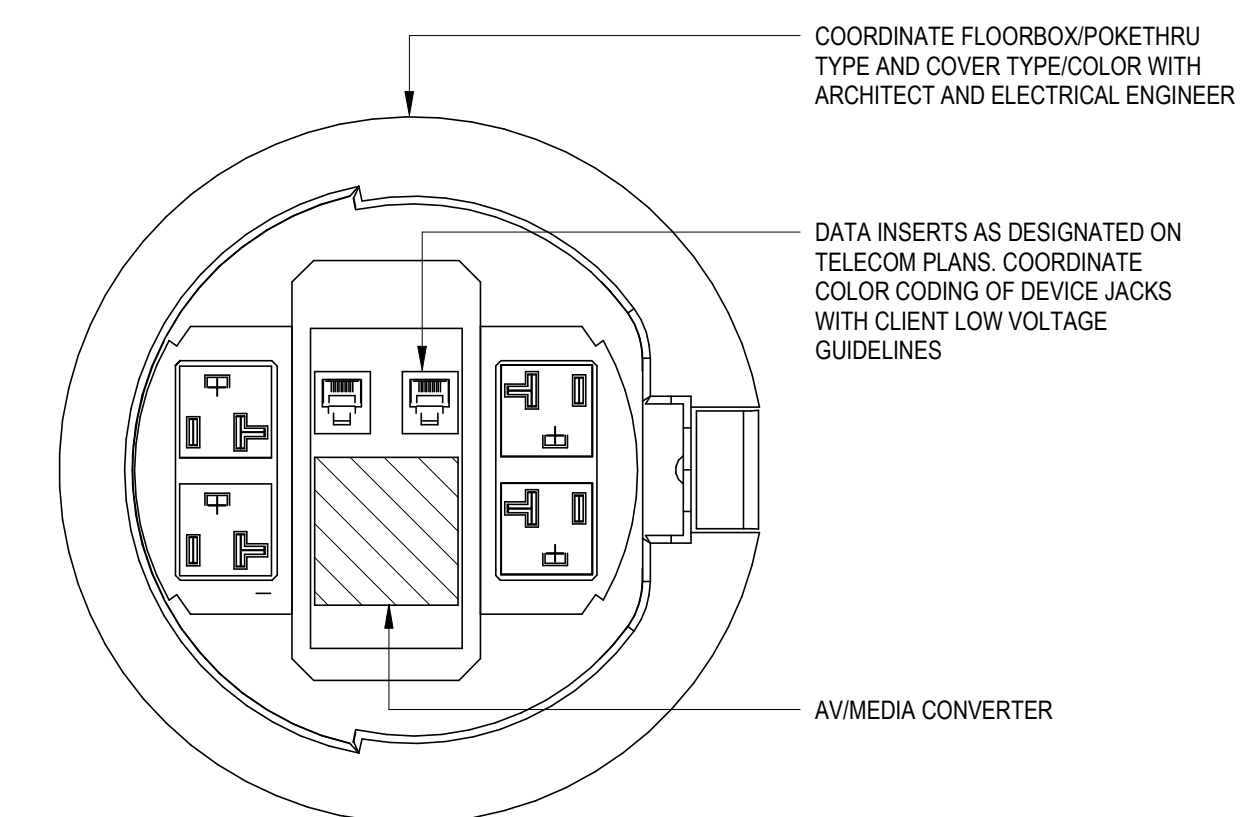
DETAIL TO BE REPLACED BY MANUFACTURER SPECIFIC MOUNTING METHODS
